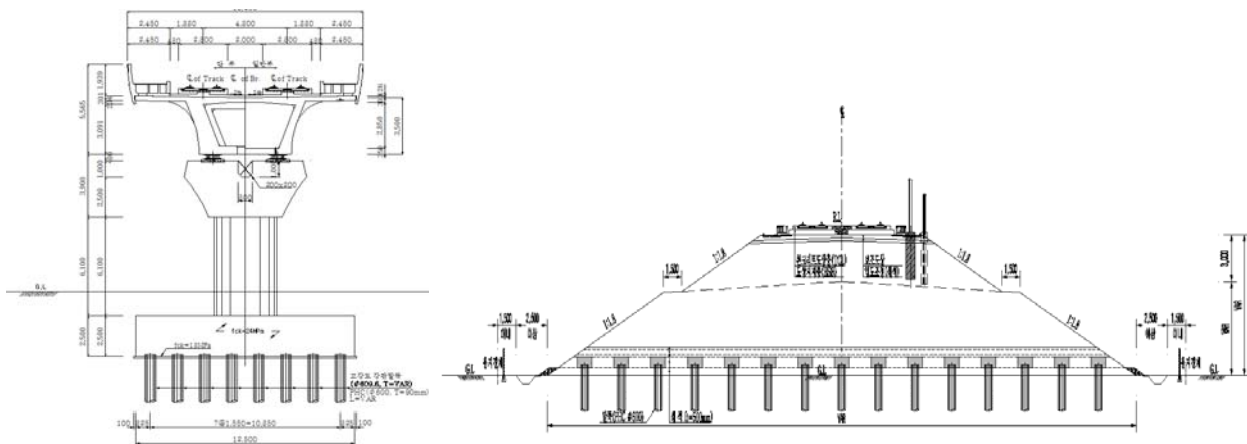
The cross sectional view of the bridge and the pile-supported embankment
